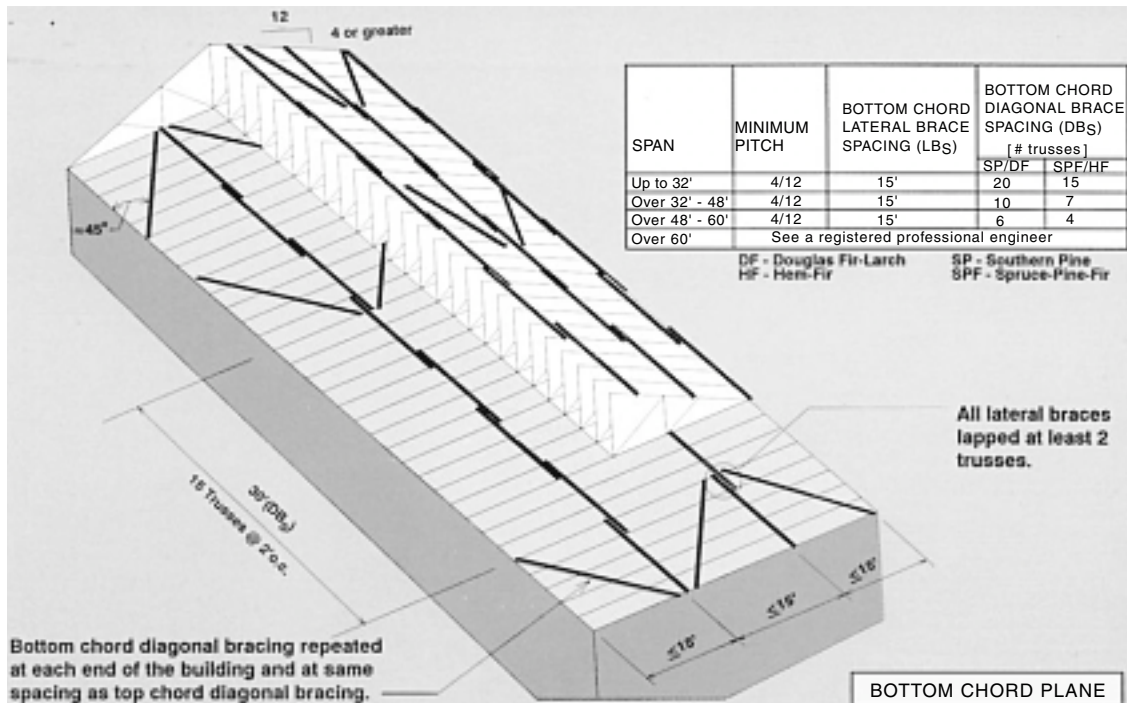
Bracing roof trusses. (Reproduced from HIB-91, courtesy of Truss Plate Institute.)
